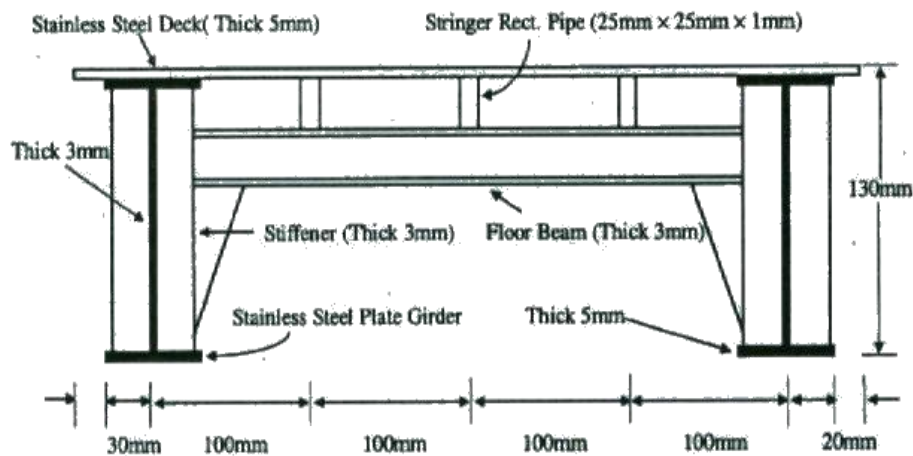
Model Plate-Girder Bridge (Kim et al. 2003)
